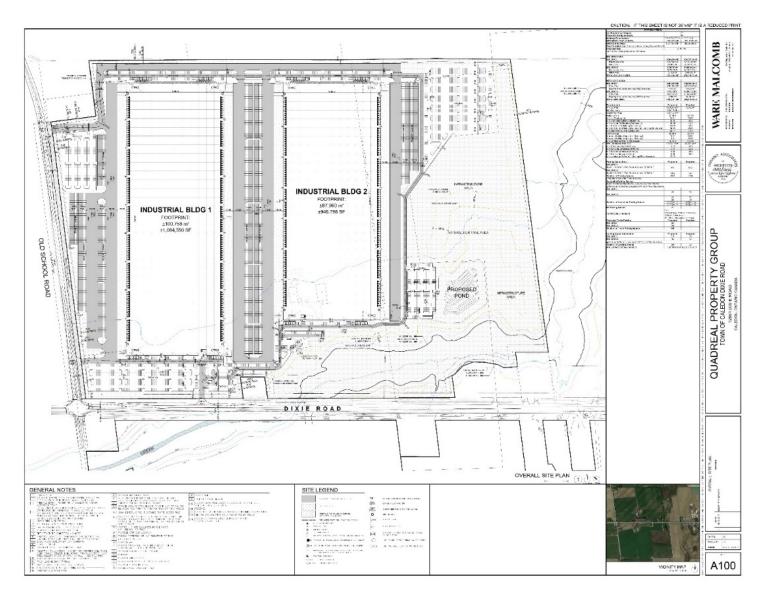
Proposed Site Plan of 12861 Dixie Road, Caledon, Ontario
